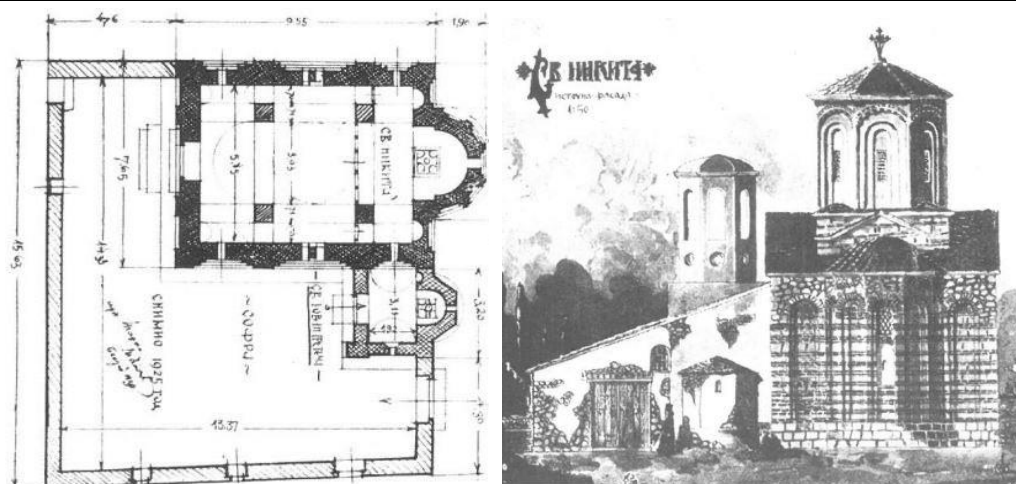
Later additions on St. Nikita church, floor plan (left), view (right), [5]
